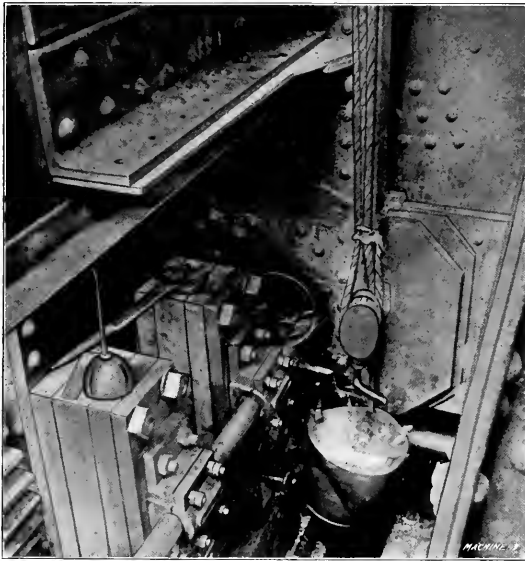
Drilling Series of Axial Holes through Old 10-inch Pin to collapse it
